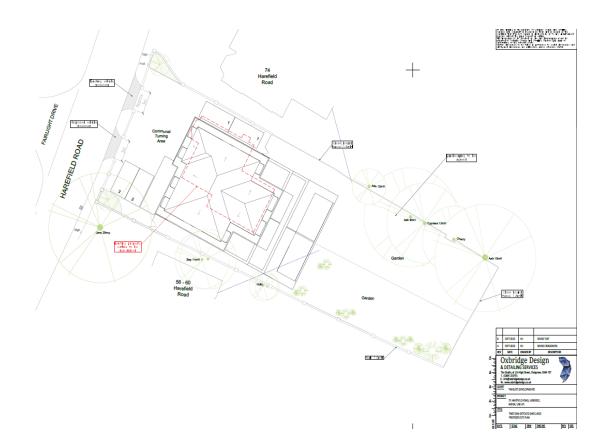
Proposed Plan (please note – larger version of plan can be found in the Committee Plan Pack)
